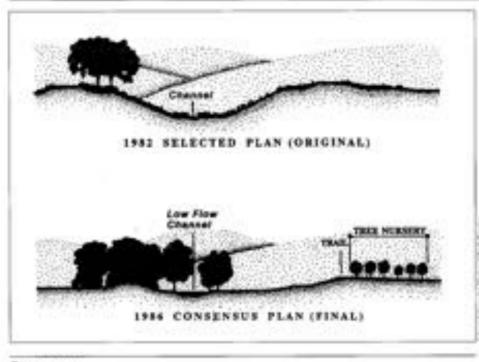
These cress sections illustrate the two alternative creek channel designs for Wildcar and San Pablo Creeks. The original 1982 plan utilizer a typical hor cross-section, high-capacity channel with little or no adjacent/foodplate; the 1985 plan eventually implemented includes a shallow law flow channel with/foodplain insoct allowing stalls, tree narvery, etc.
